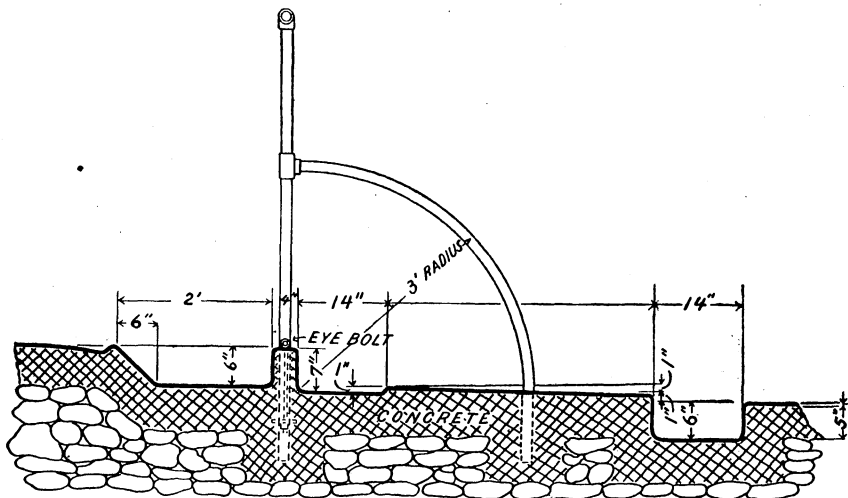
Sanitary stall construction with iron-pipe fittings and chain-hanging stanchions.
